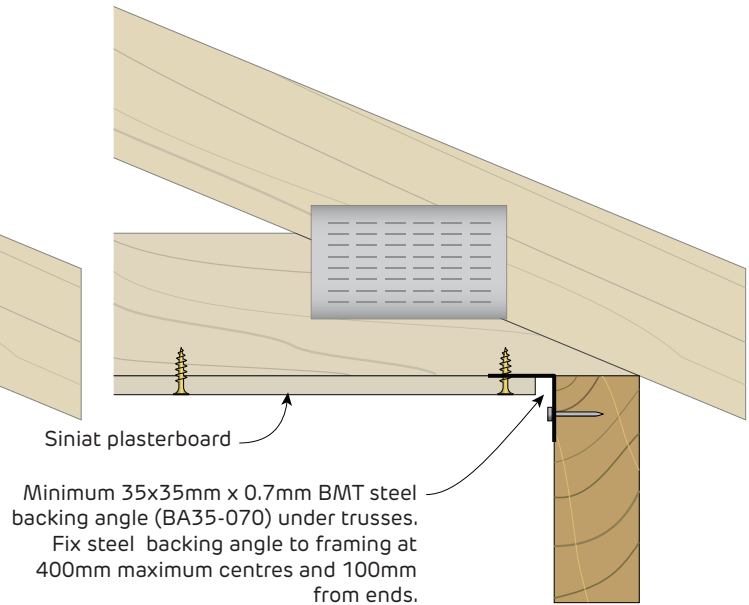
Plasterboard Ceiling Fixed to Roof Truss
